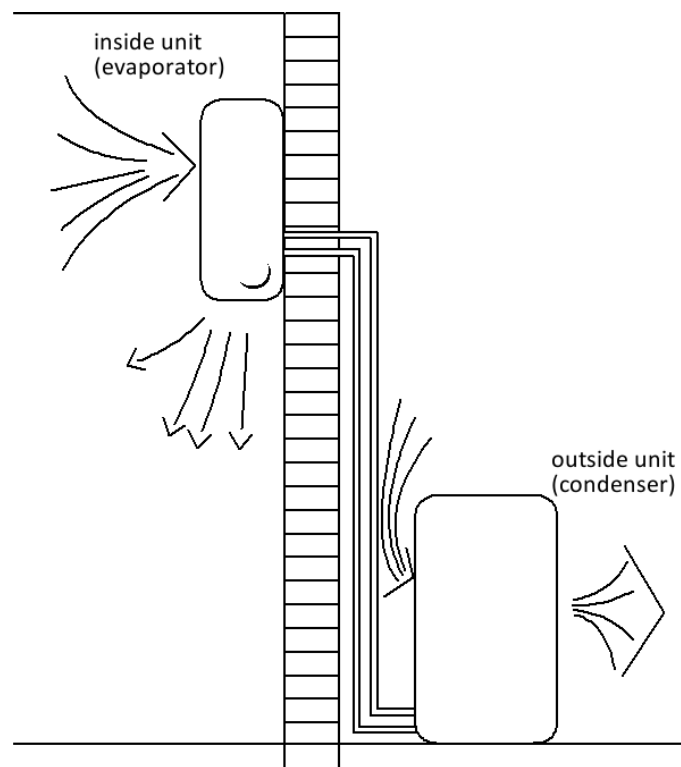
Split air conditioning unit with wall-mounted indoor unit.
